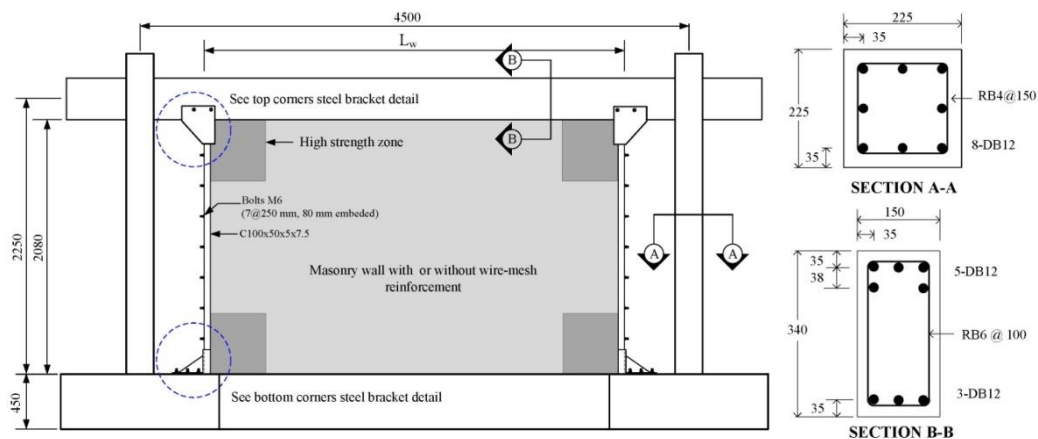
Overview of the test specimen showing the retrofitting scheme (unit: mm)
